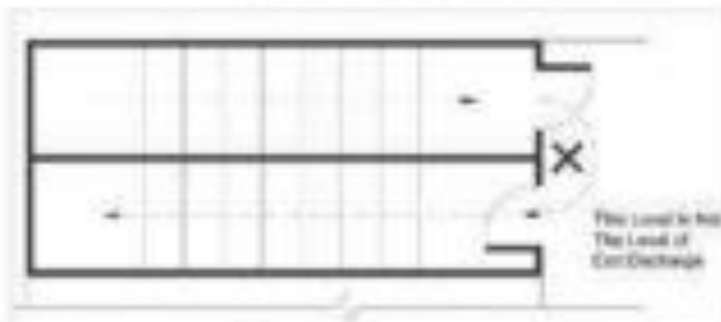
Unacceptable Arrangement for Enclosing a Stair Serving as a Required Exit
